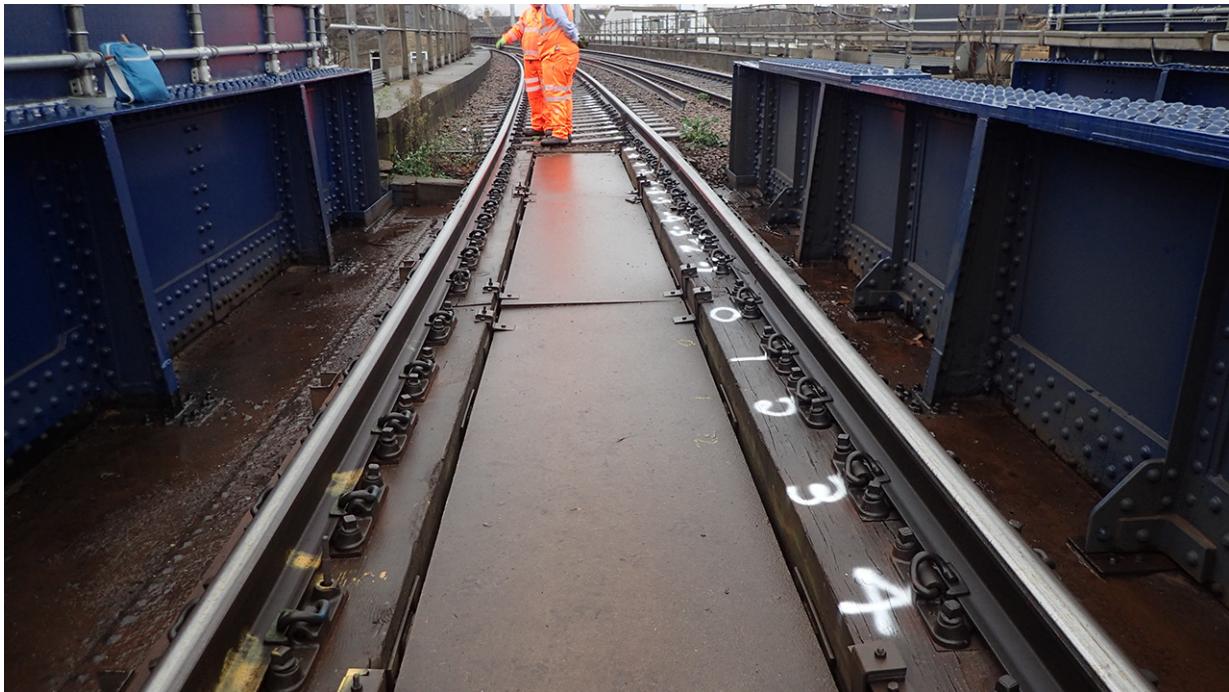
View of bridge 456 deck following the accident, but before the walkway was removed. With the walkway in place, the inside faces of the longitudinal timbers were not visible for inspection.
